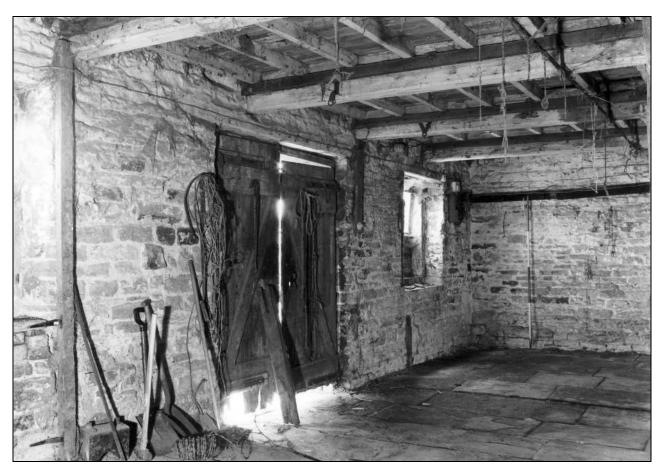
Building 1a: ground floor, from the north-west (film 3, frame 12)
